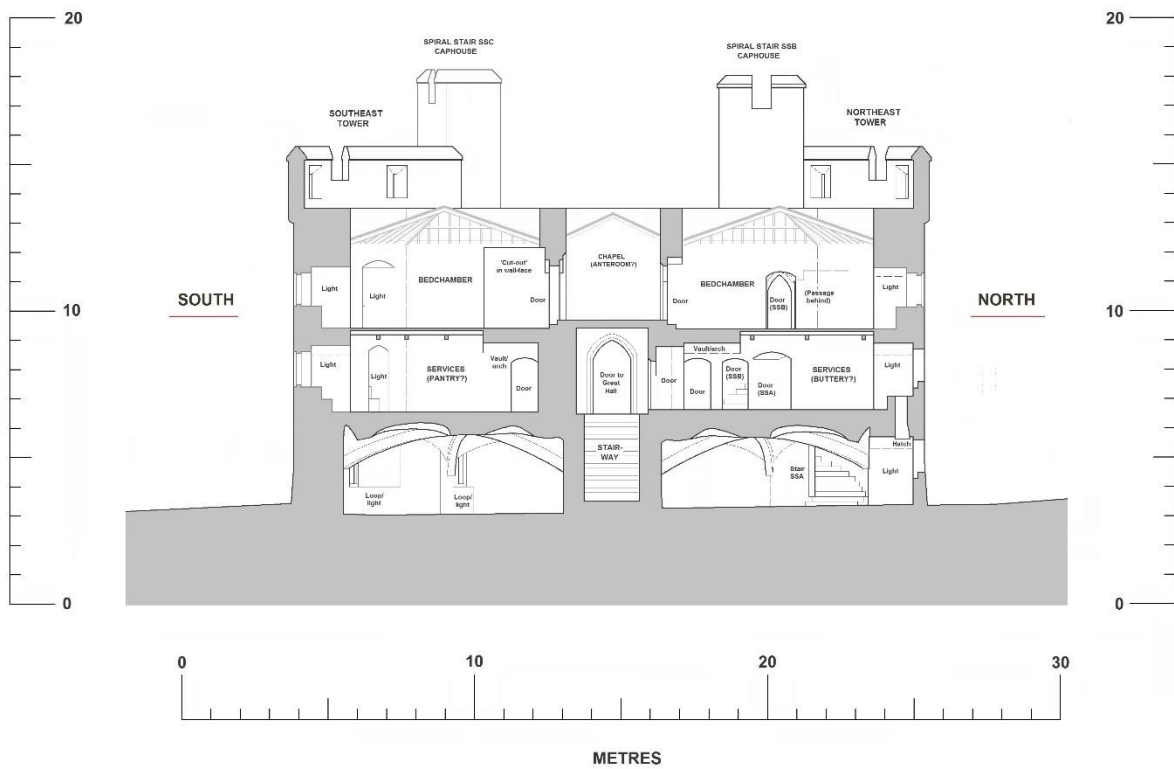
Transverse section through Picton Castle west towers, facing west – modern
